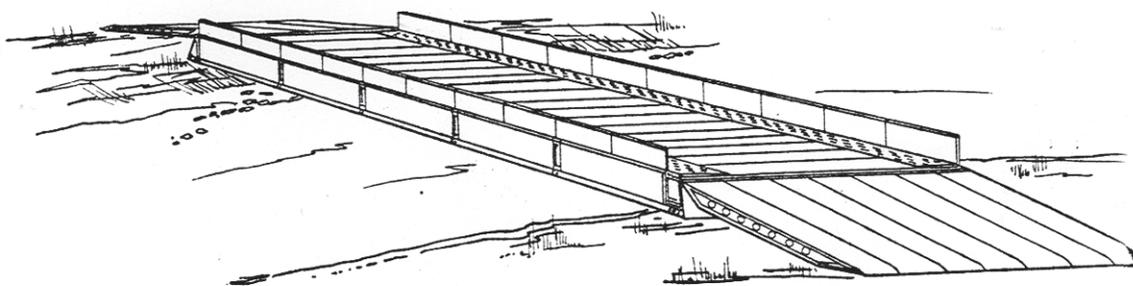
Five-Bay, Single-Story, Medium Girder (Fixed) Bridge Assembled
